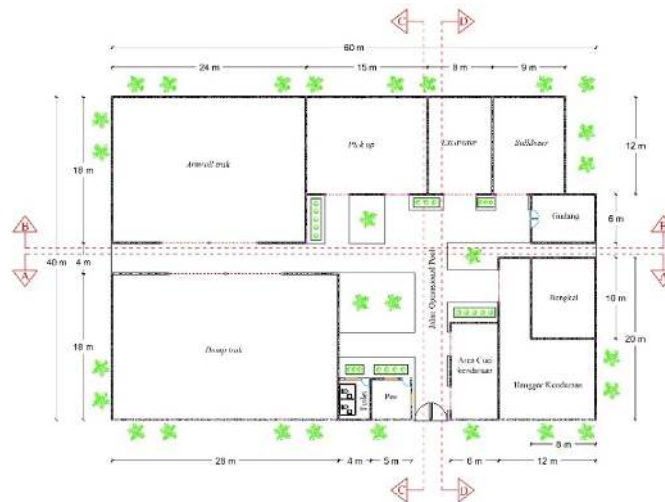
Landfill Fleet and Heavy Equipment Pool Design
